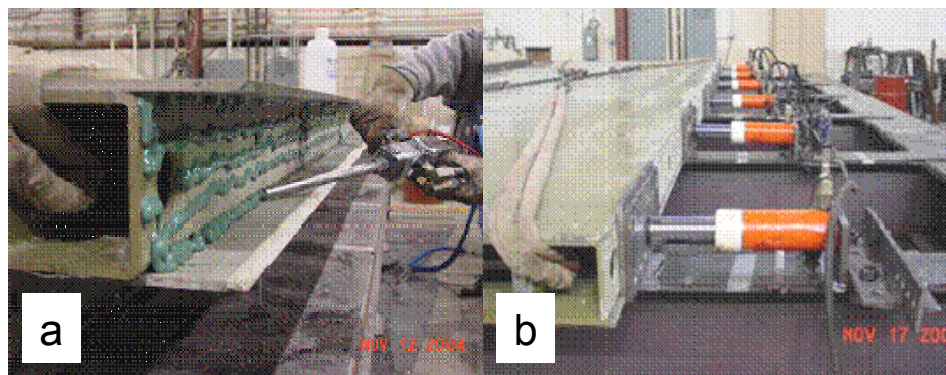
Panel-to-panel connection (a) Adhesive application b) Jacking system
